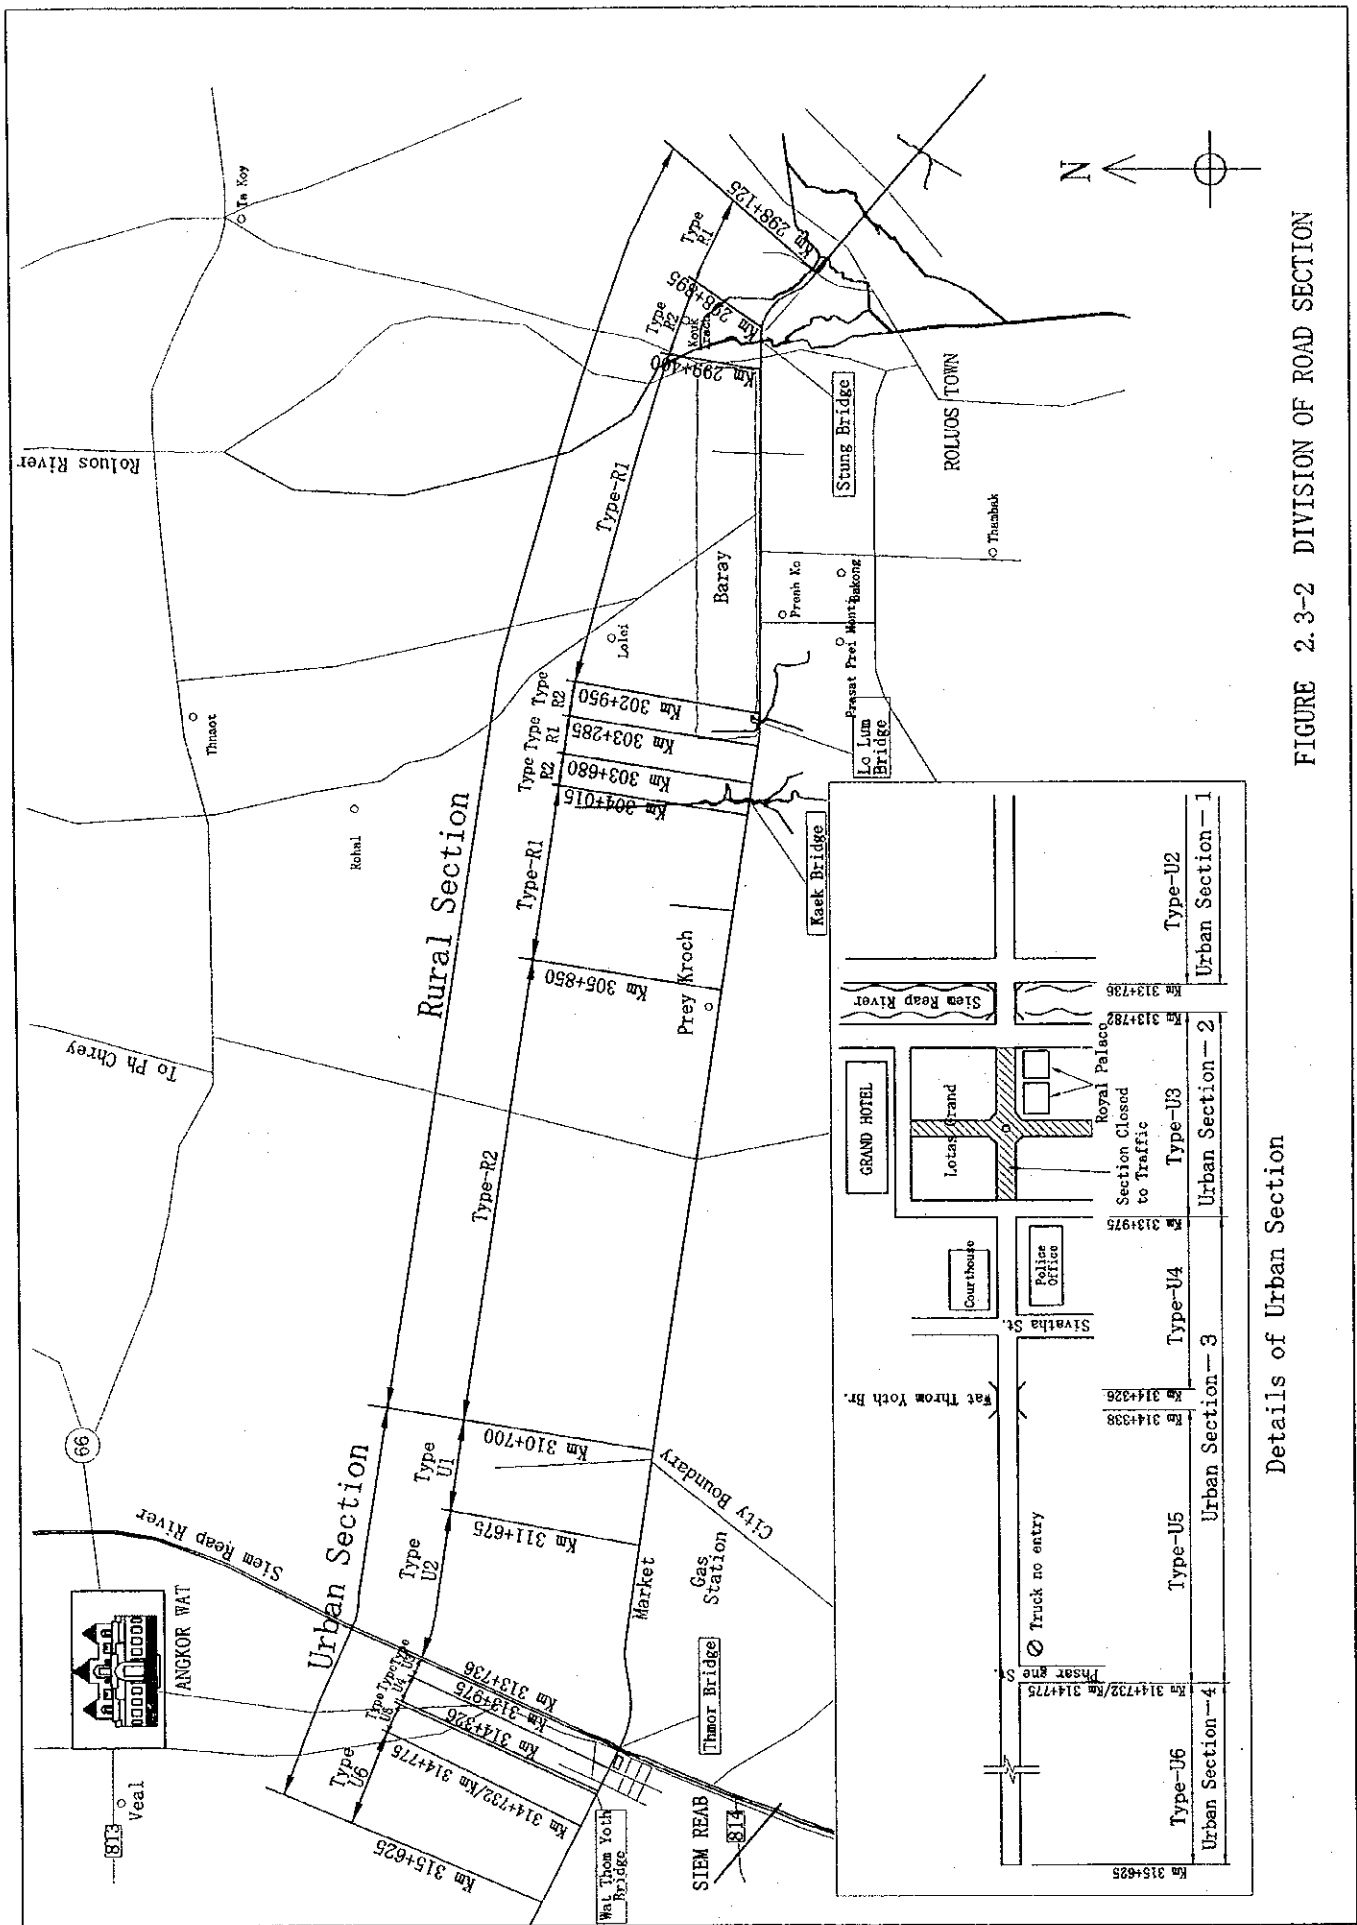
DIVISION OF ROAD SECTION
